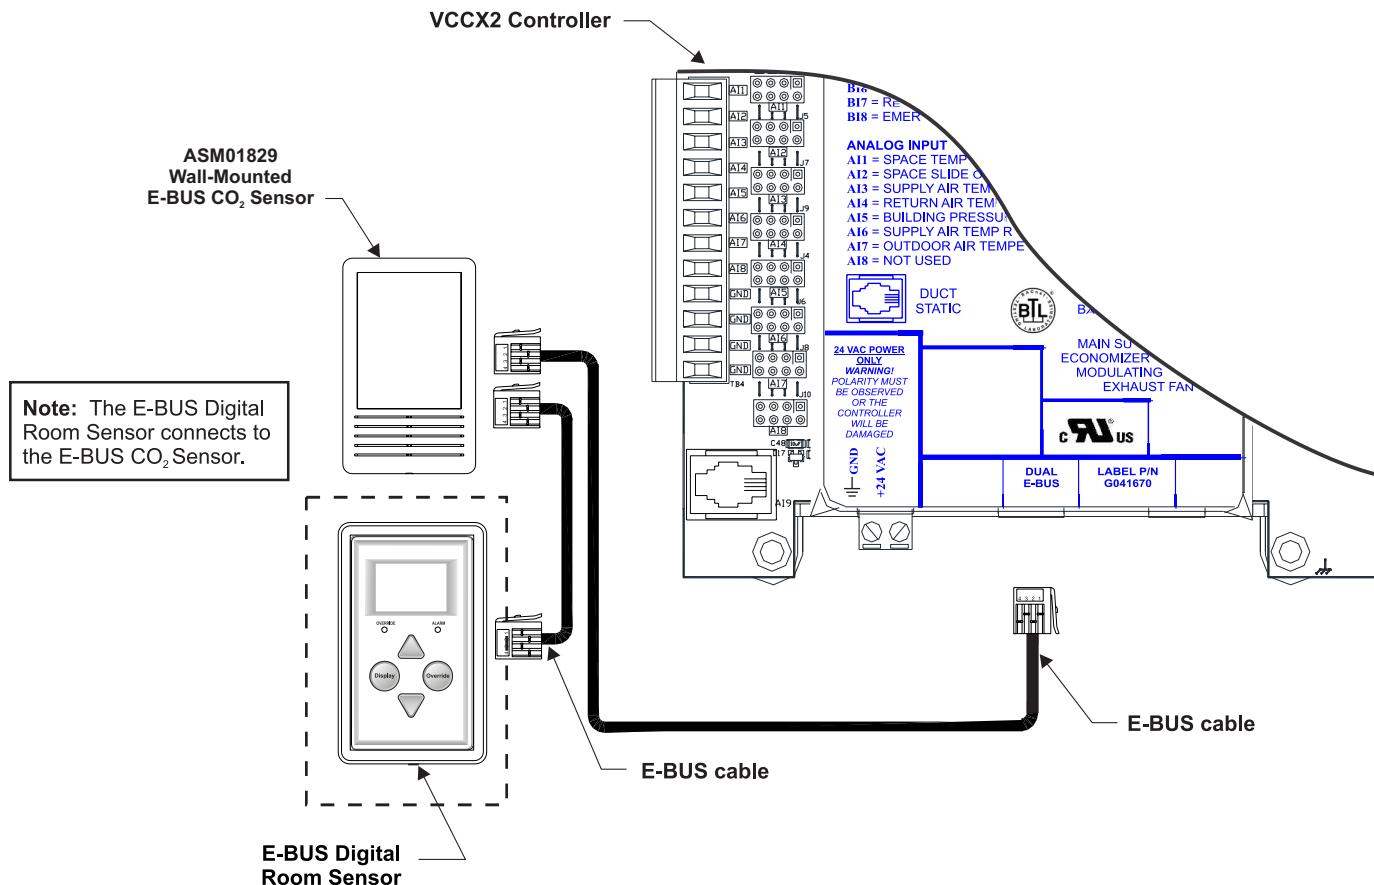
Wall-Mounted E-BUS CO₂ Sensor Wiring
